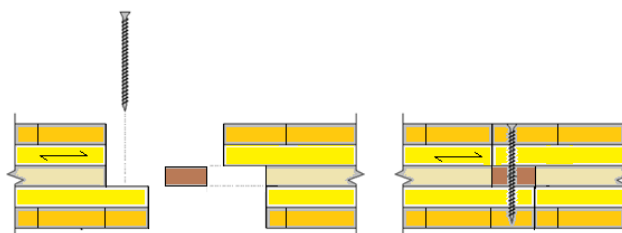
Half-lapped joint with inner timber lath for wall-to-wall or lateral floor-to-floor connection.
